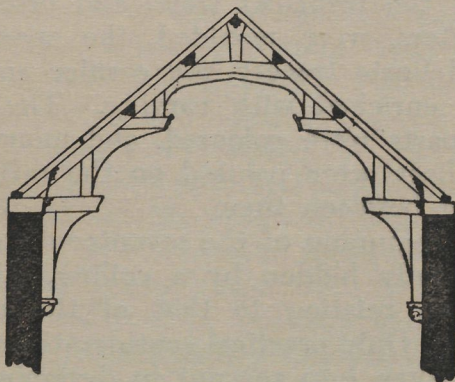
DOUBLE HAMMER-BEAM ROOF
